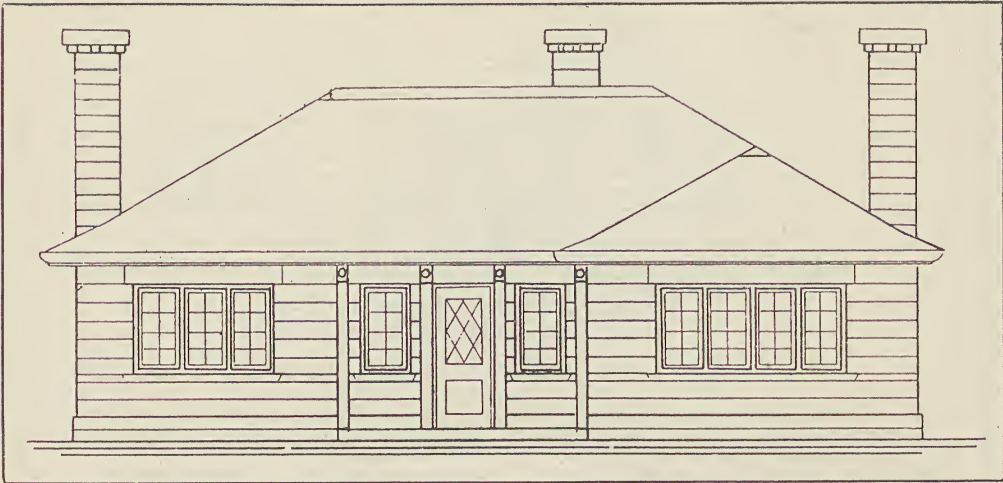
TYPE NO. 4 WITH PITCHED ROOF : ELEVATION.
